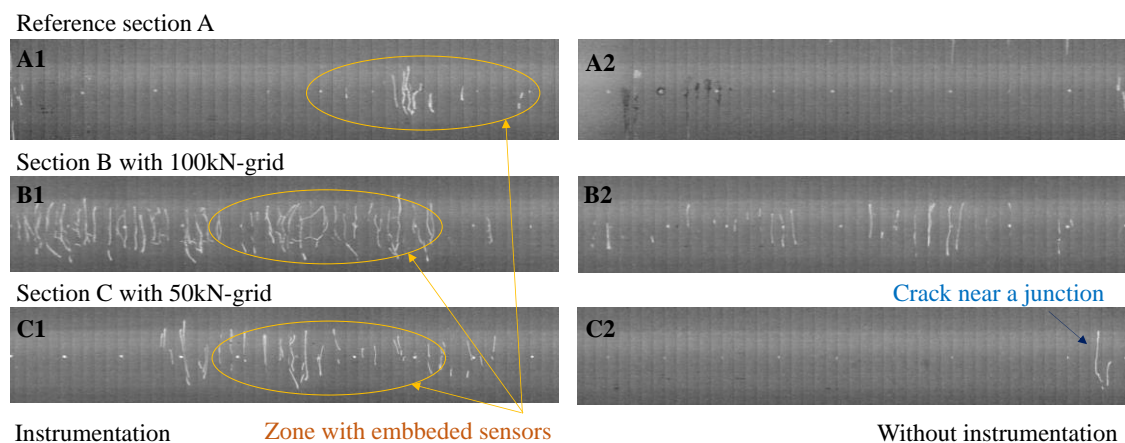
Surface crack maps of the tested pavement sections, after 2.2 million load cycles.
